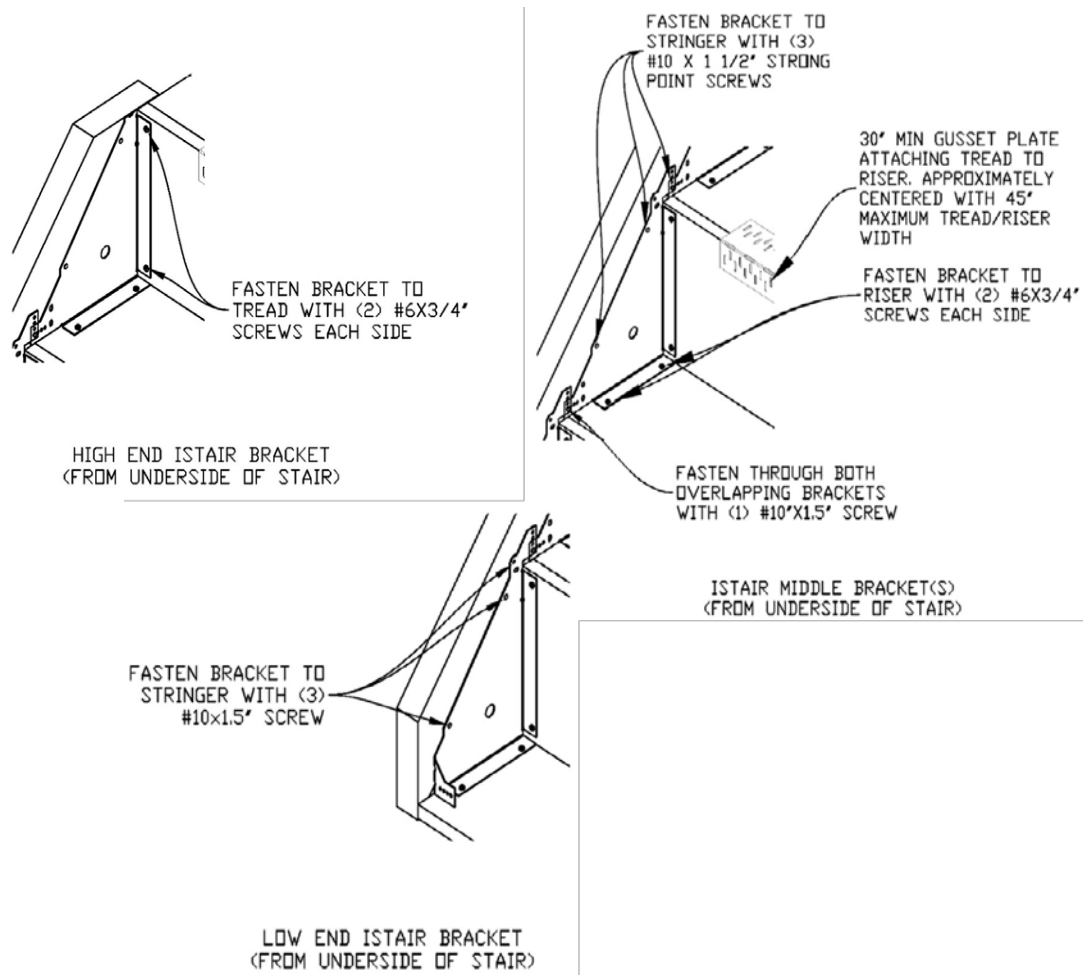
IStair™ SYSTEM BRACKET TO RISER, STRINGER, AND TREAD INSTALLATION DETAILS
